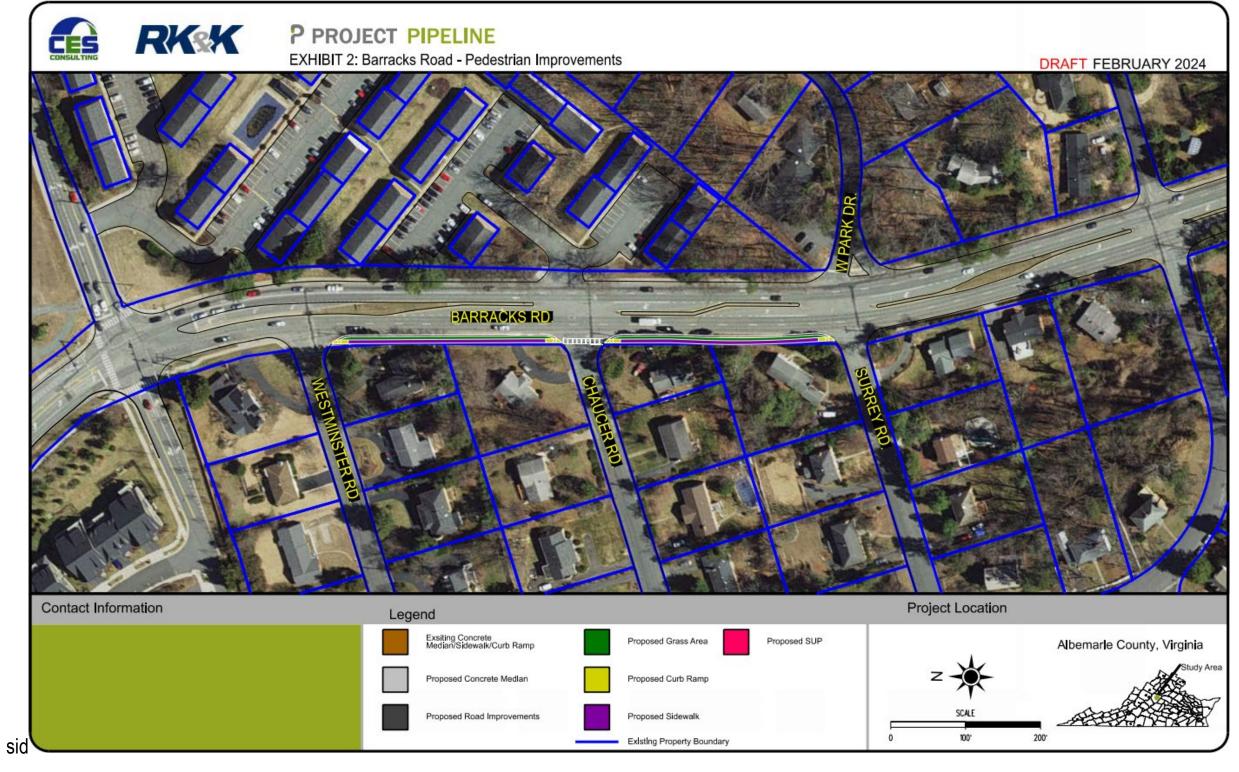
Barracks Road (Route 654) – Layout for Concepts 2
